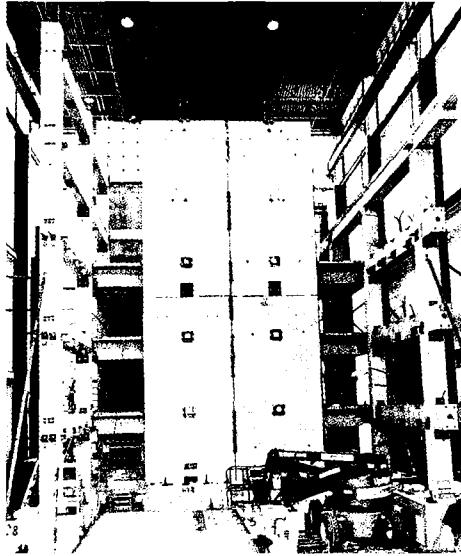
Precast Post-tensioned Wall Panels During Construction of the PRESSS Five-Storey Precast Building Test^(P19).
